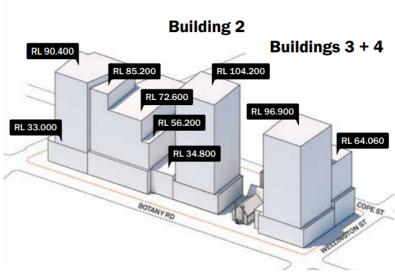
| 3D model of proposed building envelopes (source: Applicant's EIS)
